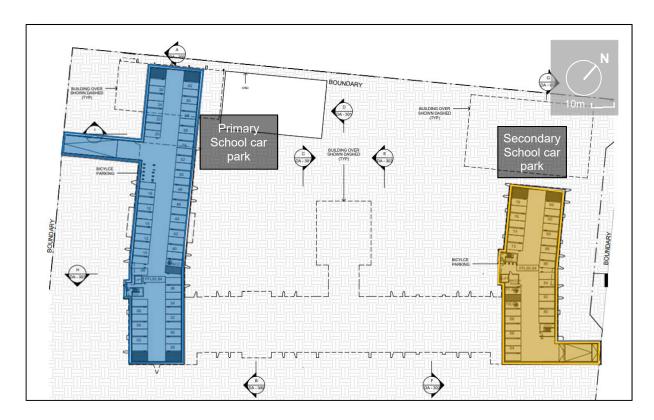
| Primary and secondary schools basement car parking plans (Source: Applicant's EIS 2019)
